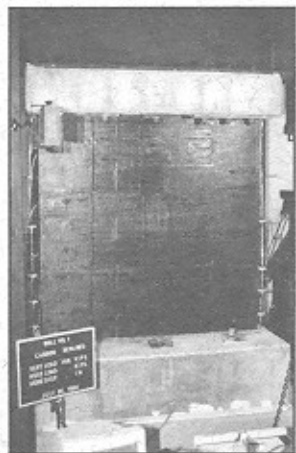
Overlay system for repair and retrofit concrete and masonry bridges
